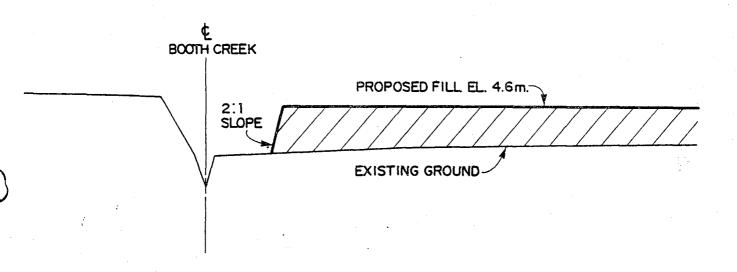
TYPICAL CROSS SECTION OF BOOTH CREEK
